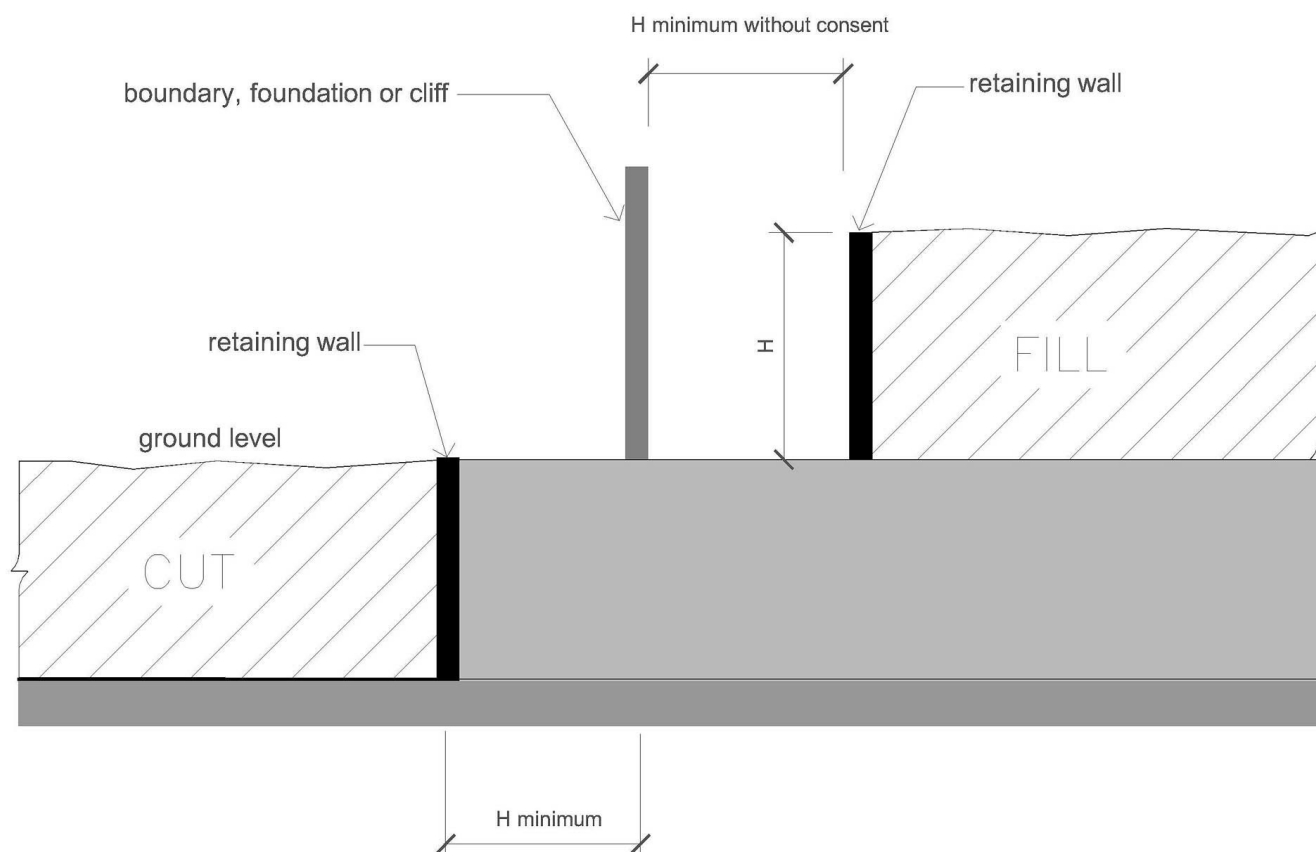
B: Cut and fill supported by retaining walls (elevation view)
